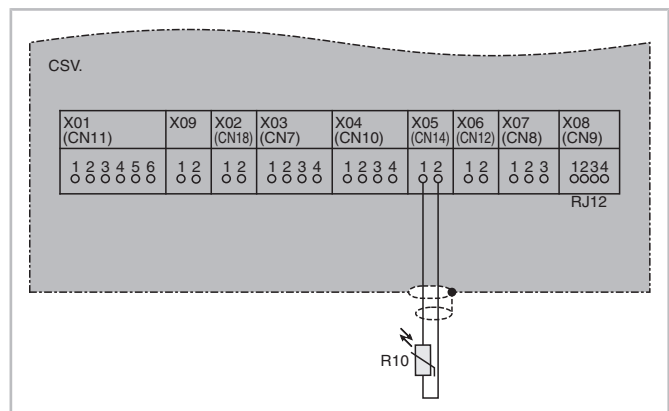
Electrical connection of the optional temperature sensor R10 to terminal strip X05 (CN14) which is part of the control board located in the lower part of the FI housing
